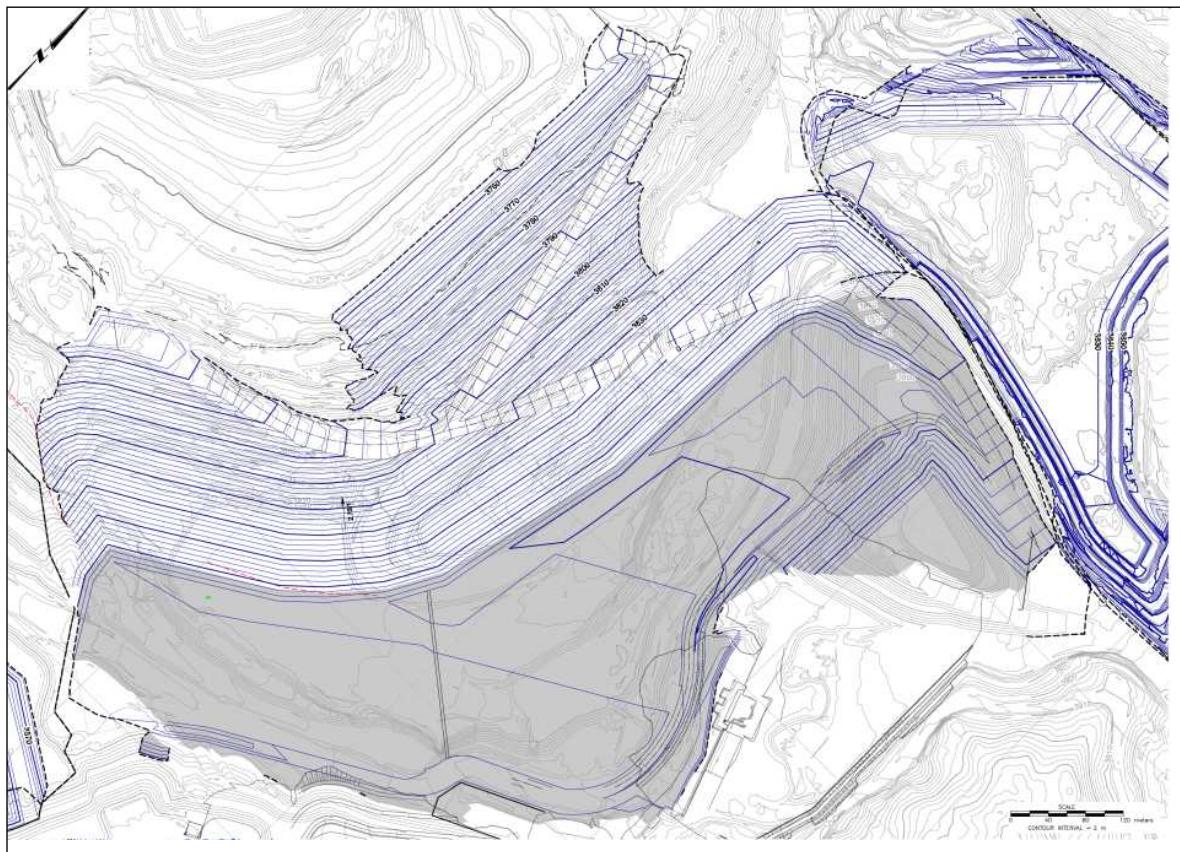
Layout of the Waste Storage Facility (WSF) as foundation of the heap leach pad
